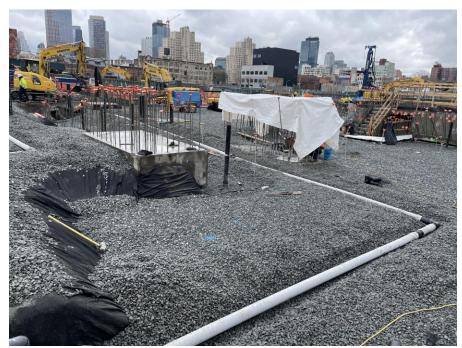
Kingdom installing SMD system piping in the southern part of Society Brooklyn (facing southeast)
